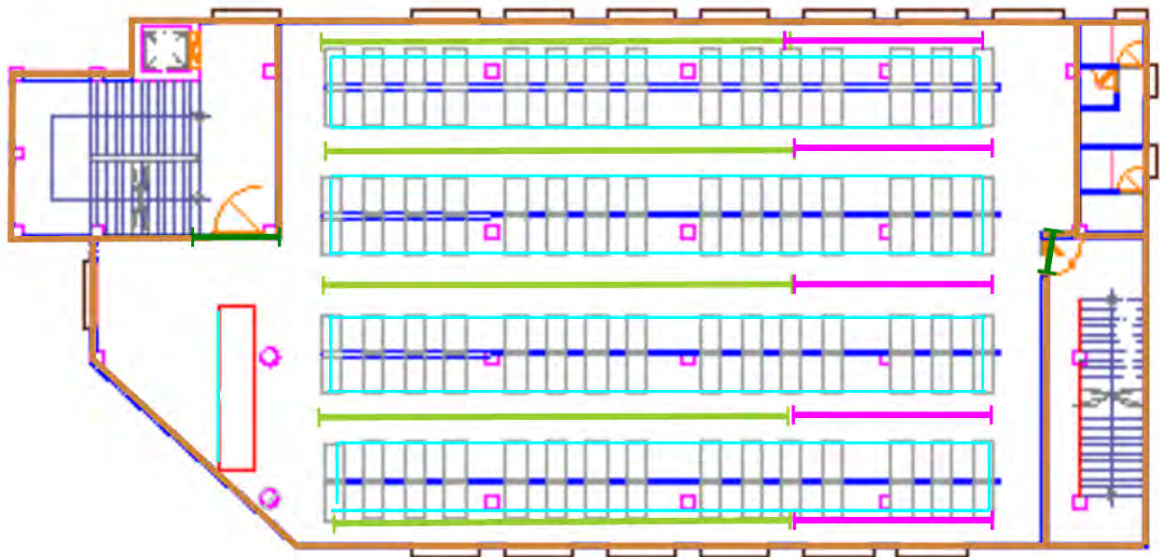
(c) Spatial layout of Power Tex (4th floor plan). . light green, blue and magenta denotes as PedSource and dark green line as PedSink.
